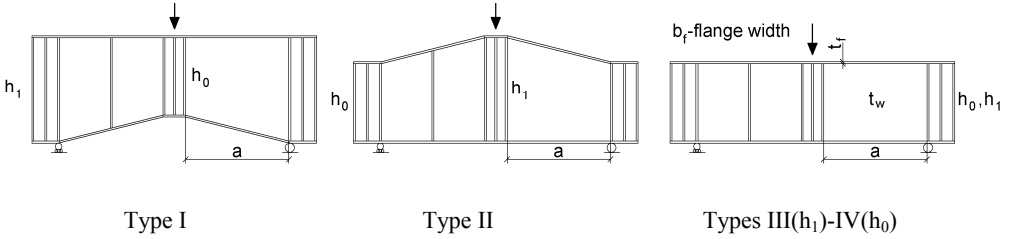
a) Plate girder with inclined flange under tension b) Plate girder with inclined flange under compression c) Rectangular plate girders with the largest depth ( $h_1$ ) and the smallest depth ( $h_0$ ).
